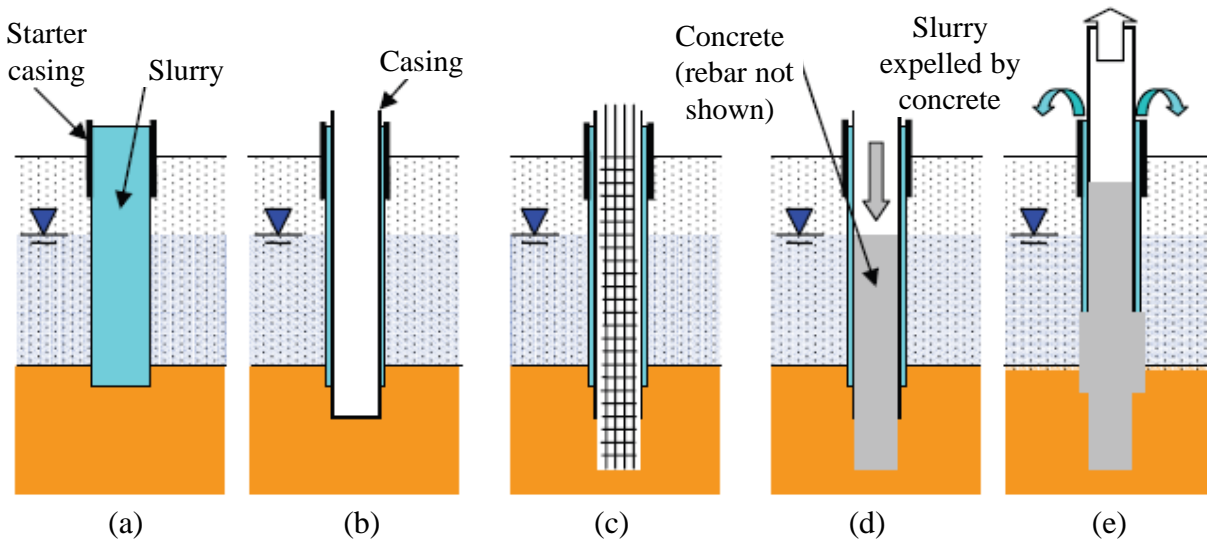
Construction using casing through slurry-filled starter hole: (a) drill with slurry; (b) set casing and bail slurry; (c) complete and clean excavation, set reinforcing; (d) place concrete to head greater than external water pressure; (e) pull casing while adding concrete (adapted from Brown et al. 2010)
